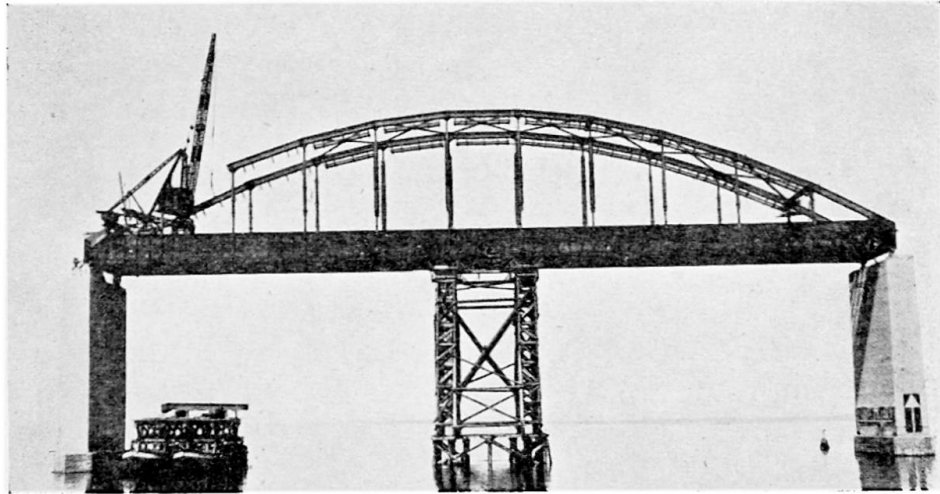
Storstrom Bridge. Plate girders of navigation span assembled in two halves by floating crane and connected on temporary trestle. Arch rib and hangers erected by travelling crane
